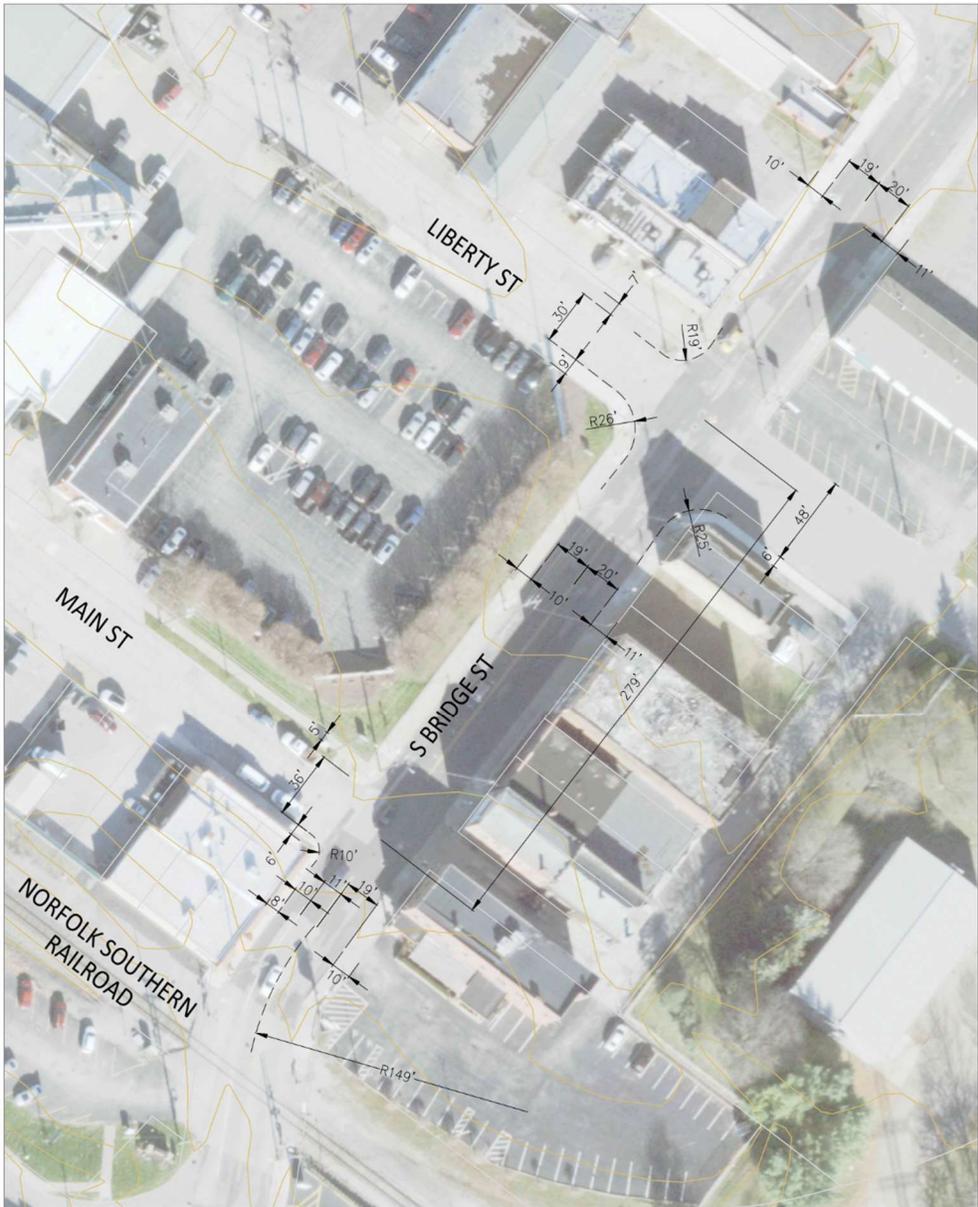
Facility dimensions, the northern portion of South Bridge Street.
